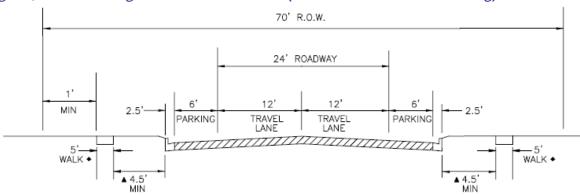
Street Design: Residential Collector (2 Lanes with On-Street Parking)
